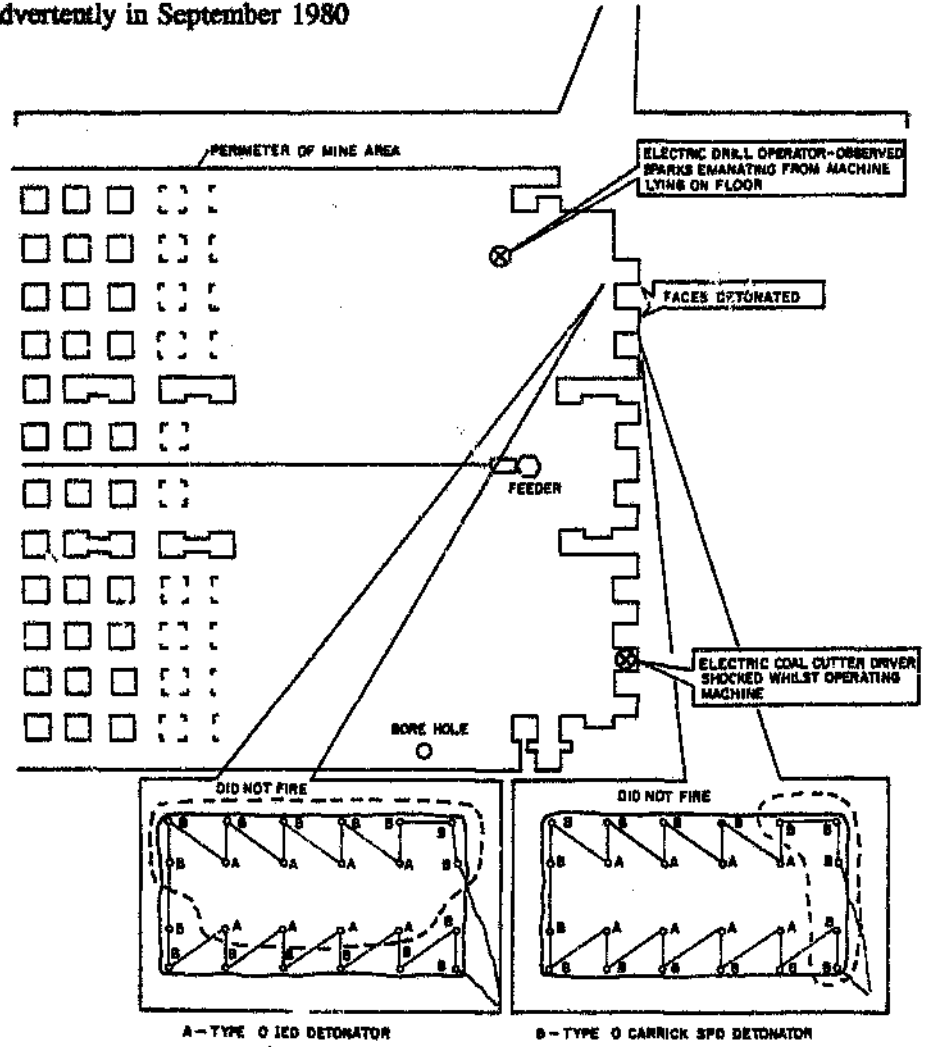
B Detailed plan of the section in which detonations occurred at two faces, showing the faces and interconnections between the detonators.
